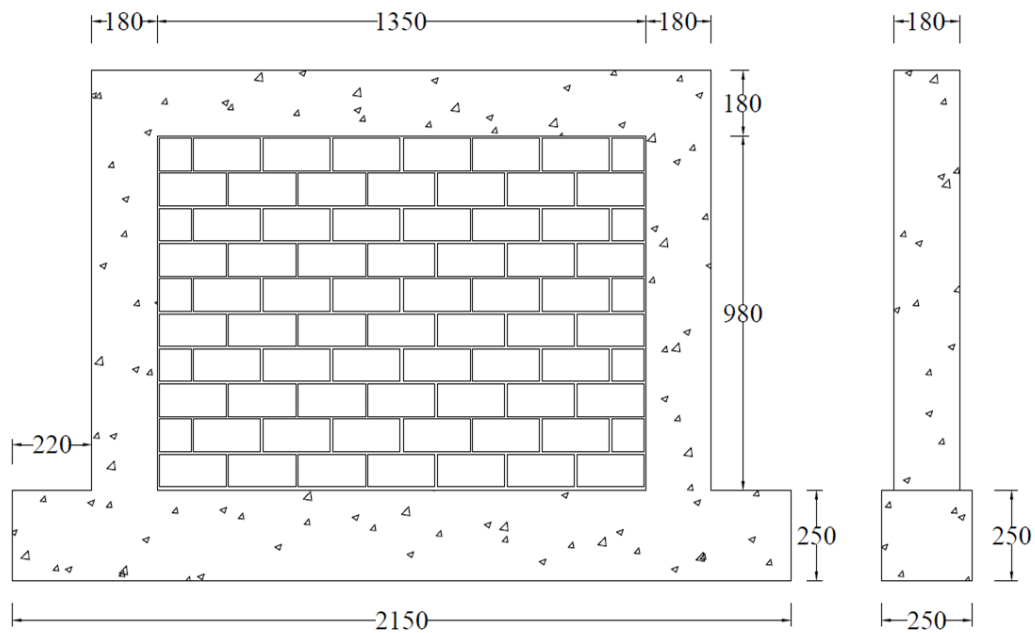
Details of RC Infilled Frame Specimens (unit: mm)
